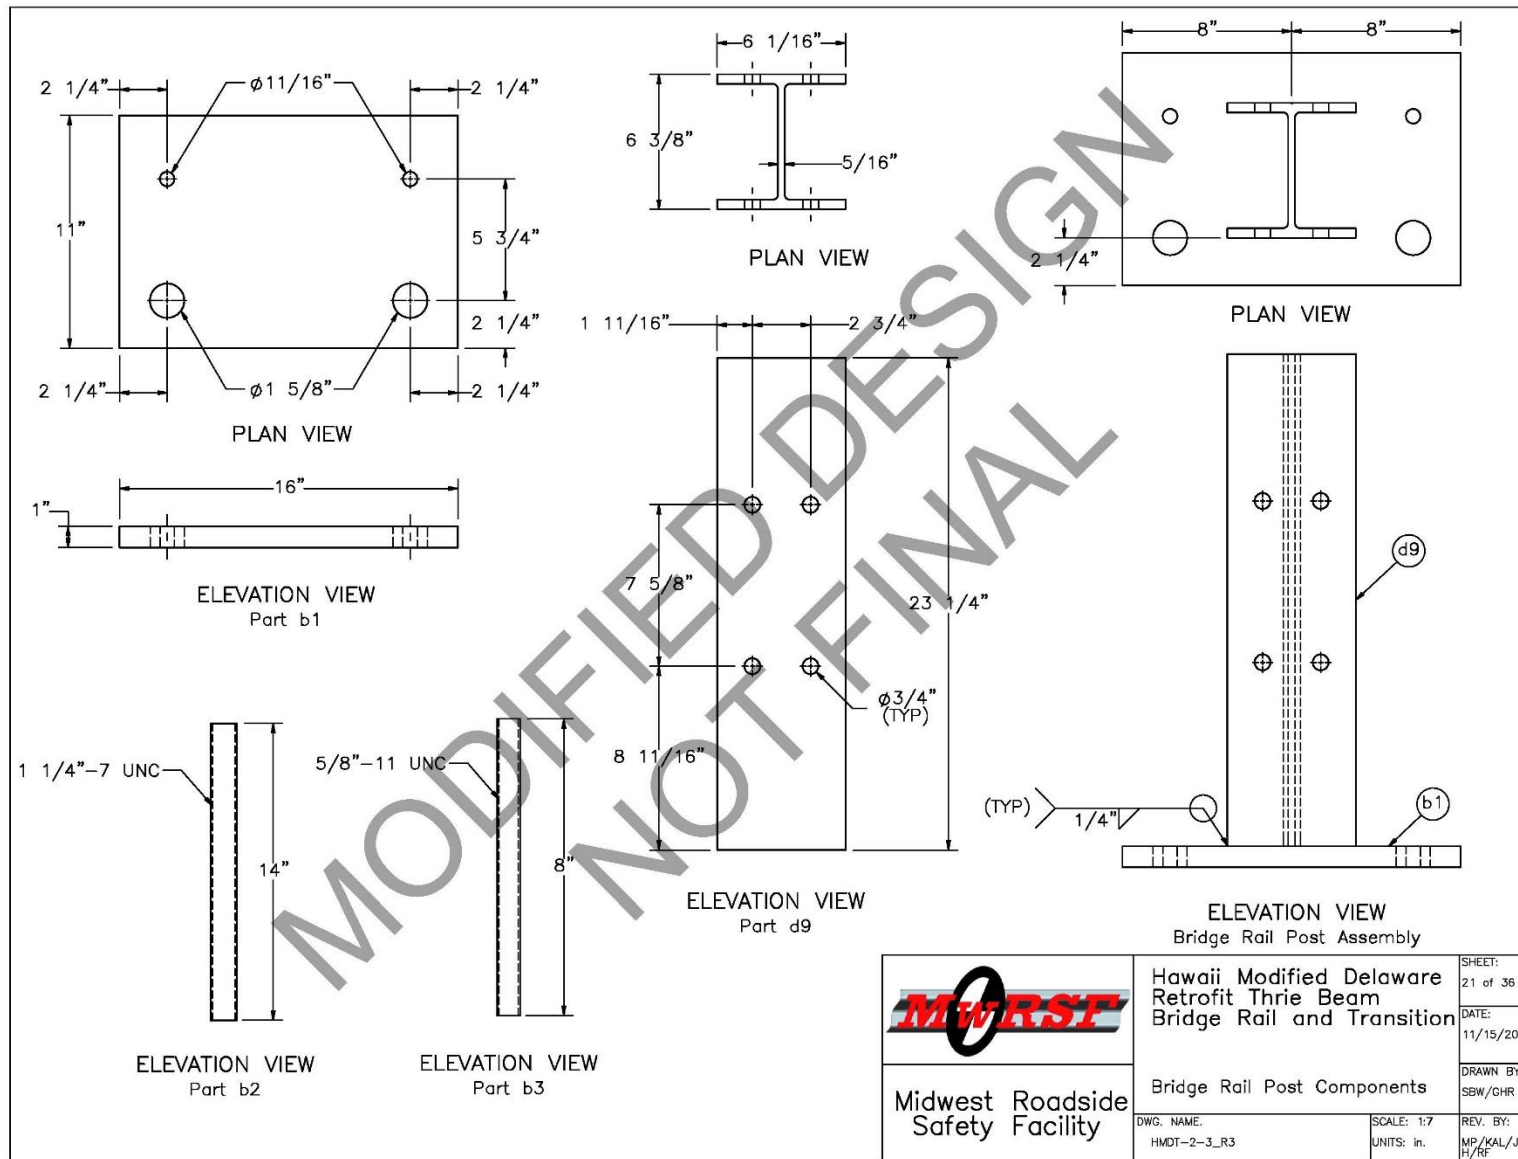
Bridge Rail Post Components, Test Nos. HMDT-2 and HMDT-3
